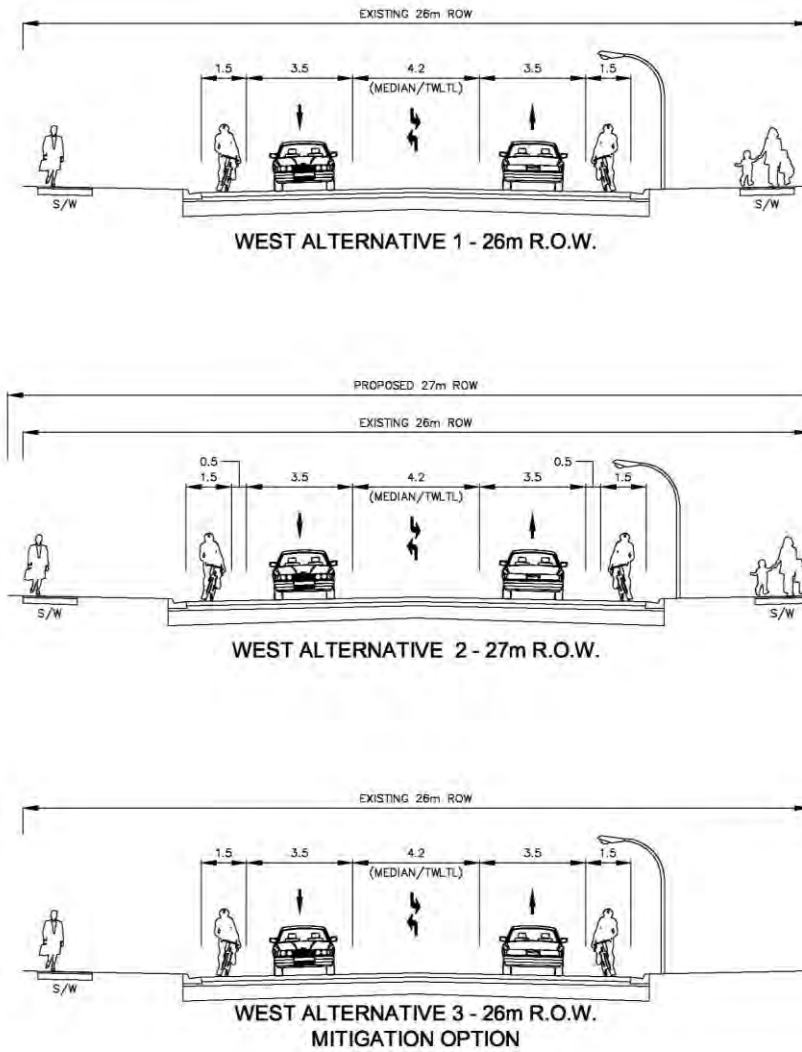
Bell Farm Road West Section Cross Section Alternatives
